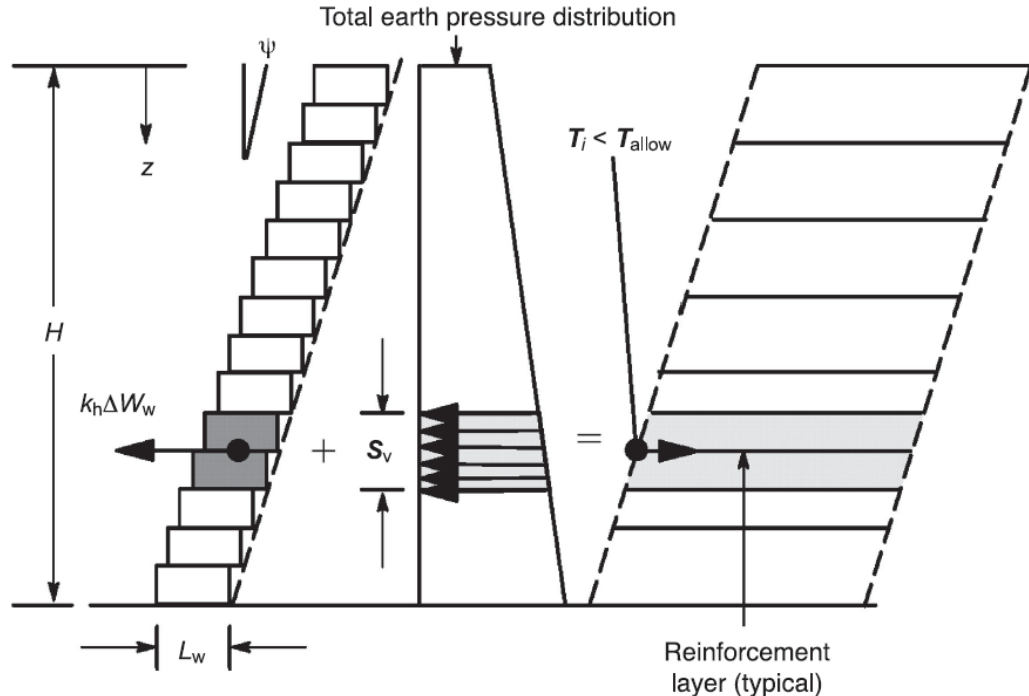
Calculation of tensile load,  $T_i$ , in a reinforcement layer due to dynamic earth pressure and wall inertia for segmental retaining walls (after Bathurst & Cai 1995)
